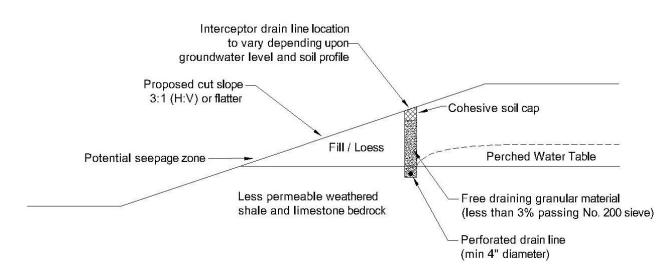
Typical Cut Slope Interceptor Drainline Cross-Section
